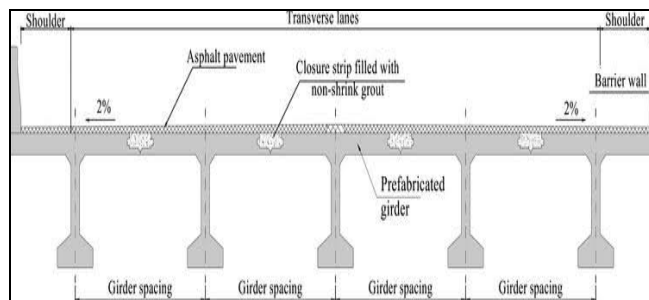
Cross Section Of Precast Concrete Girder Bridge
